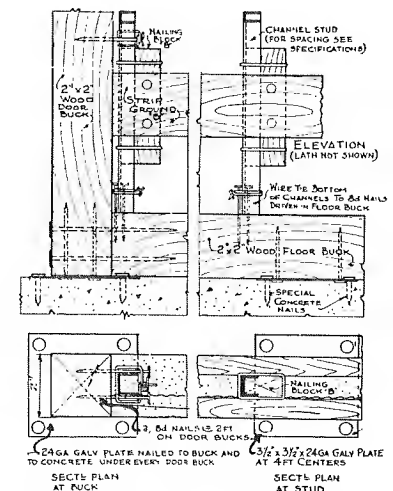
Studs secured to wood floor buck nailed to concrete floor. Wood buck facilitates movability; provides grounds.
